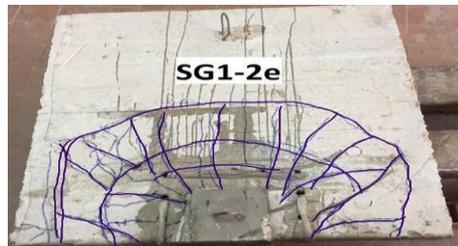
Pattern of cracking for specimen (SG1-2e).
